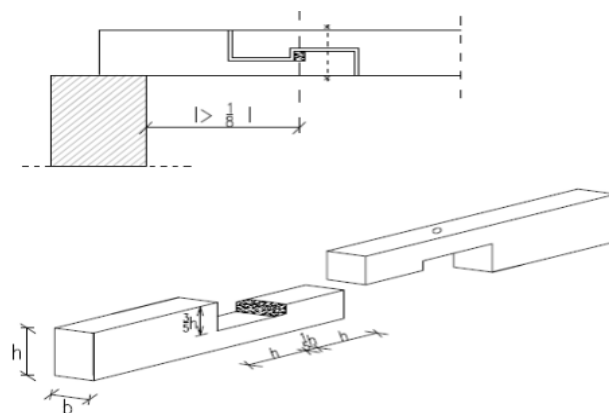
Replacement of the damaged support fragment of a beam in the distance bigger than $1/8 l$ (a_1 - a_1 , cross-section) using a lap joint with a wedge (drawing: E. Piotrowicz)
